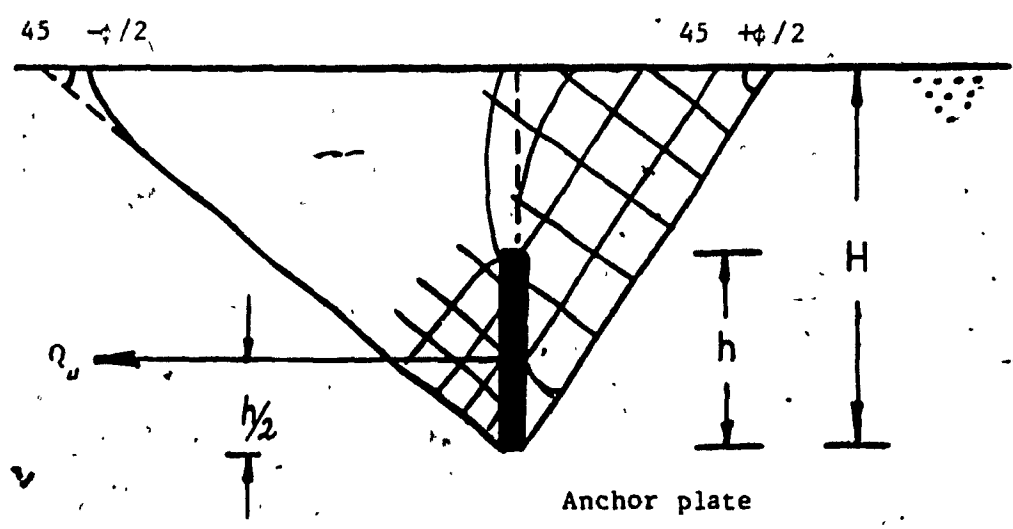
b: Shear pattern in sand adjoining an anchor wall whose upper edge is below the surface of the sand (Terzaghi 1943)
